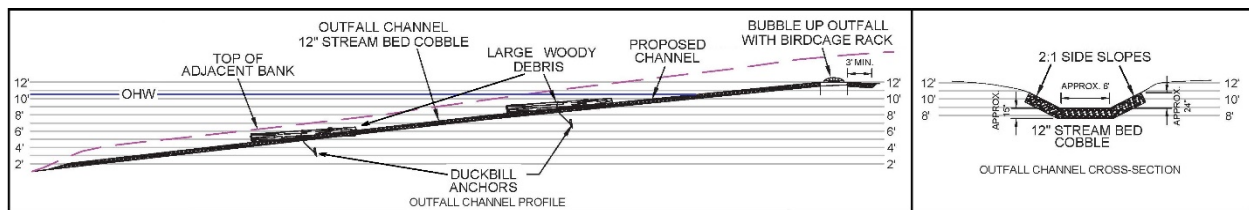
Profile and cross-section drawings of the Port of Everett’s proposed outfall and bioengineered conveyance that would be installed in the existing drainage ditch.
